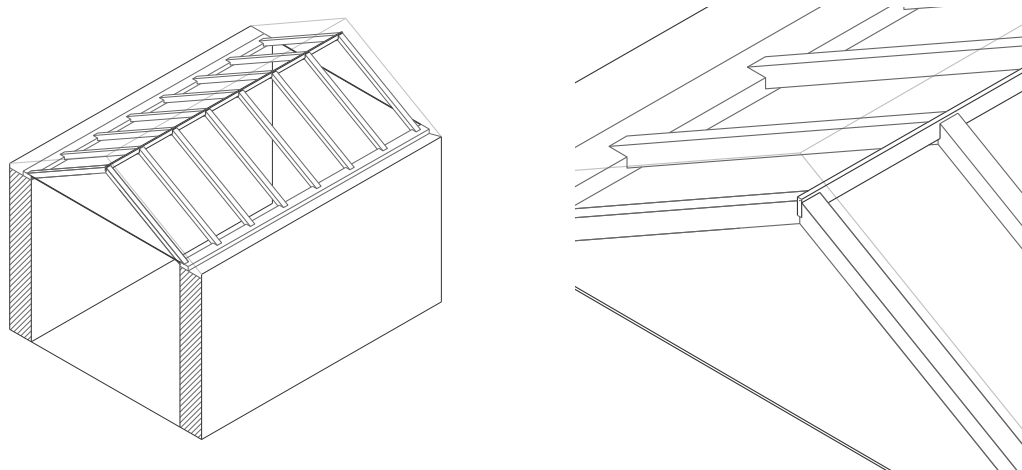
Use of a timber element to maintain the alignment of the apex in a rafter truss [credits Alice Tavares]
